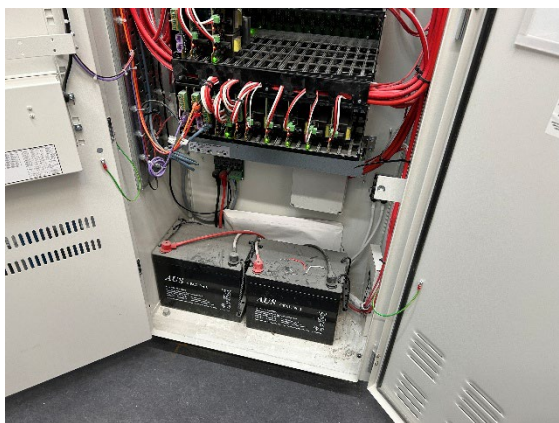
12V Batteries in the Ground Floor Fire Pump Room Control Panel.
